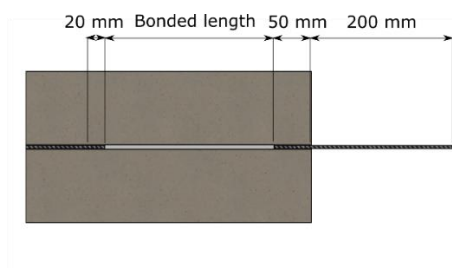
Positioning of the CFRP strip in the bonded joint.
